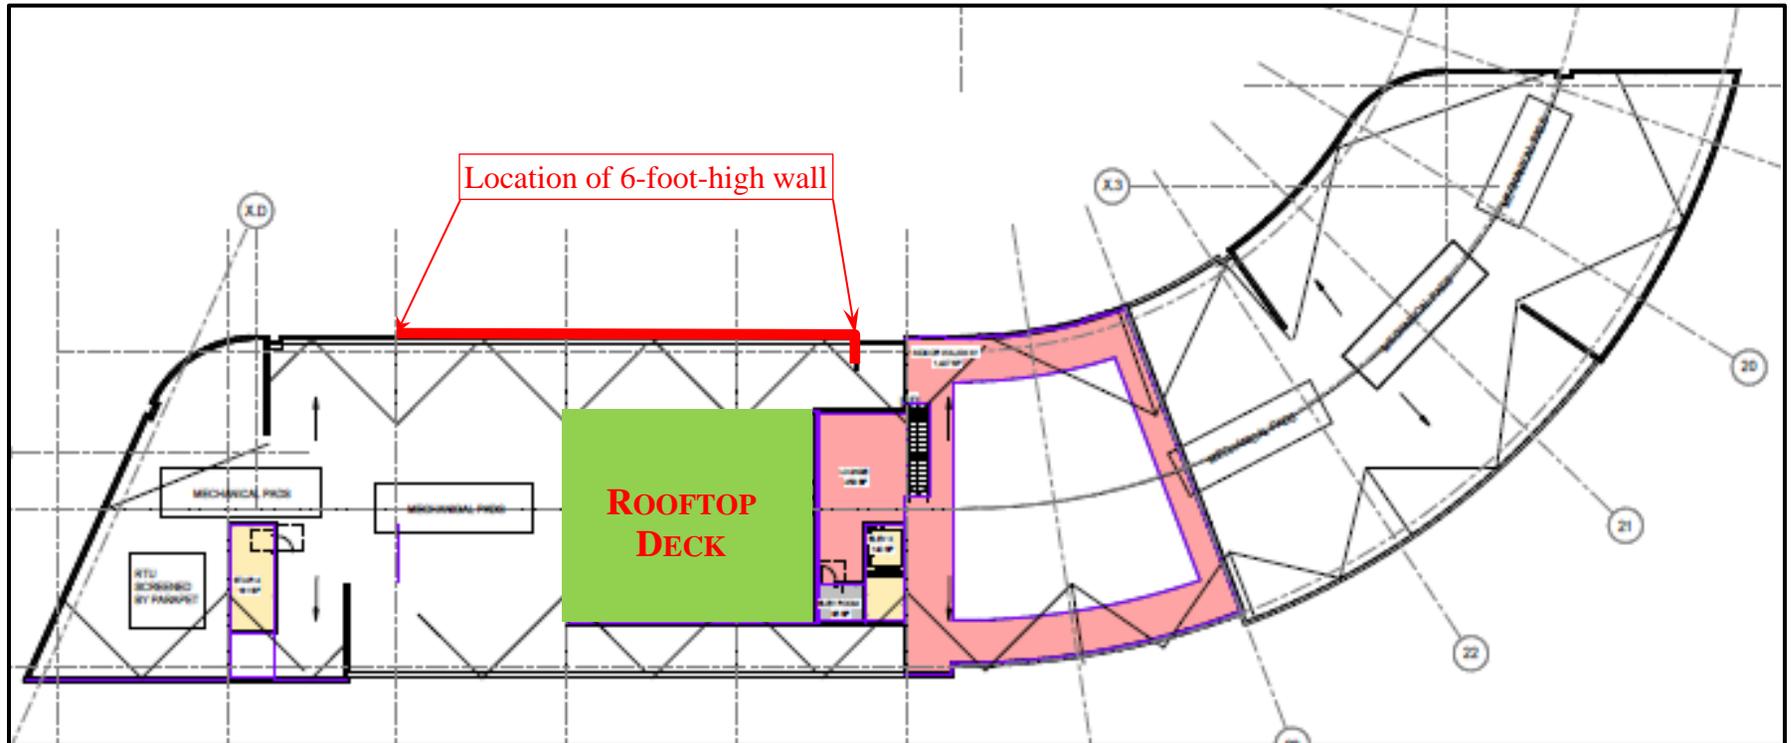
Roof Plan showing location of roof top deck and Proposed 6-foot-high parapet wall
